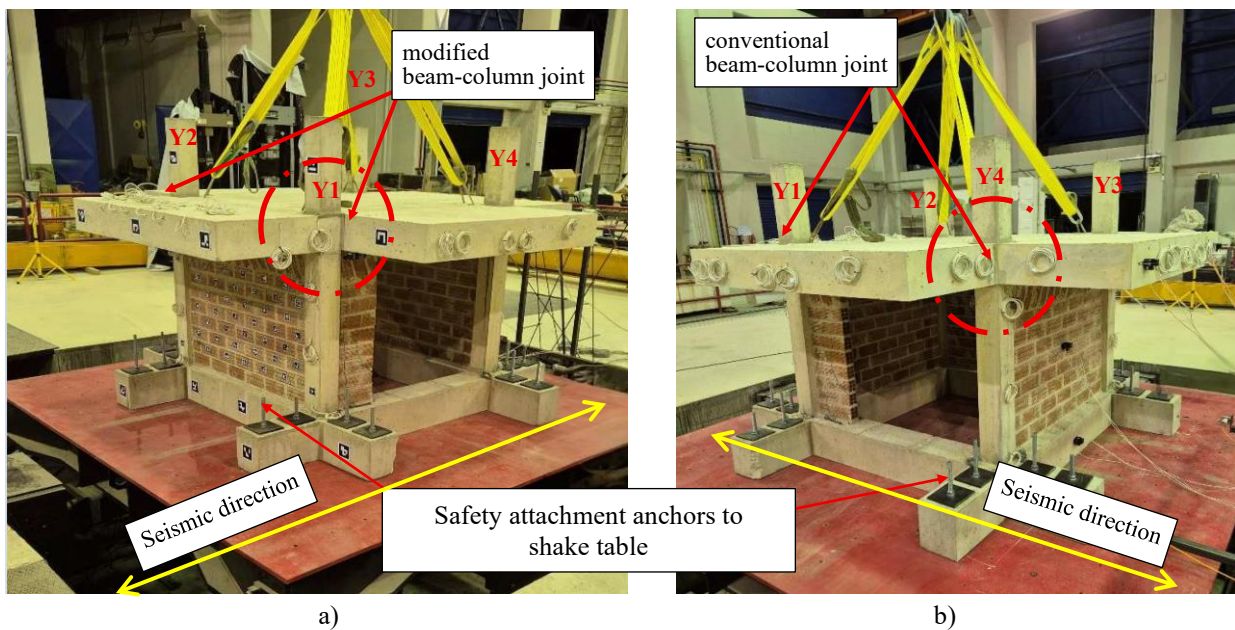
Details of two beam-column joint variations a) modified, b) conventional and slab extensions.
